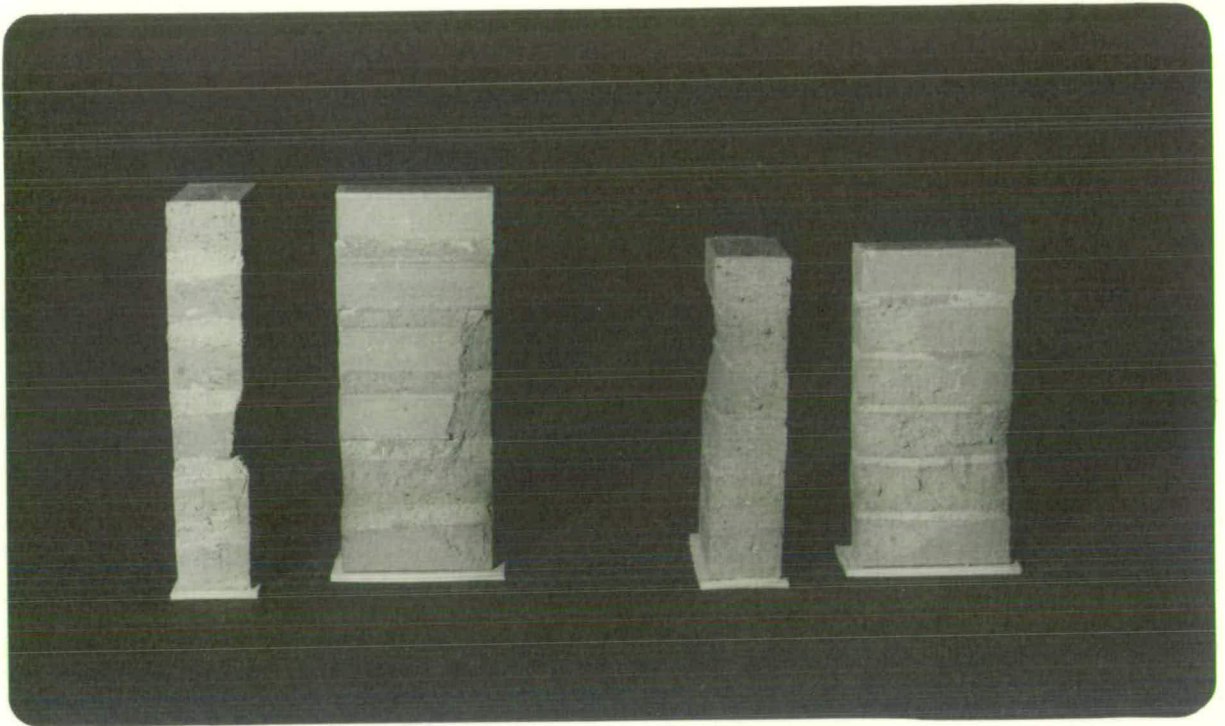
FAILURE MODE IN BRICKWORK PRISMS
